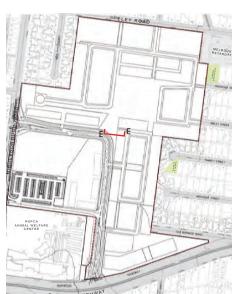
LINKING SPACE PLAN (ILLUSTRATIVE ONLY)
